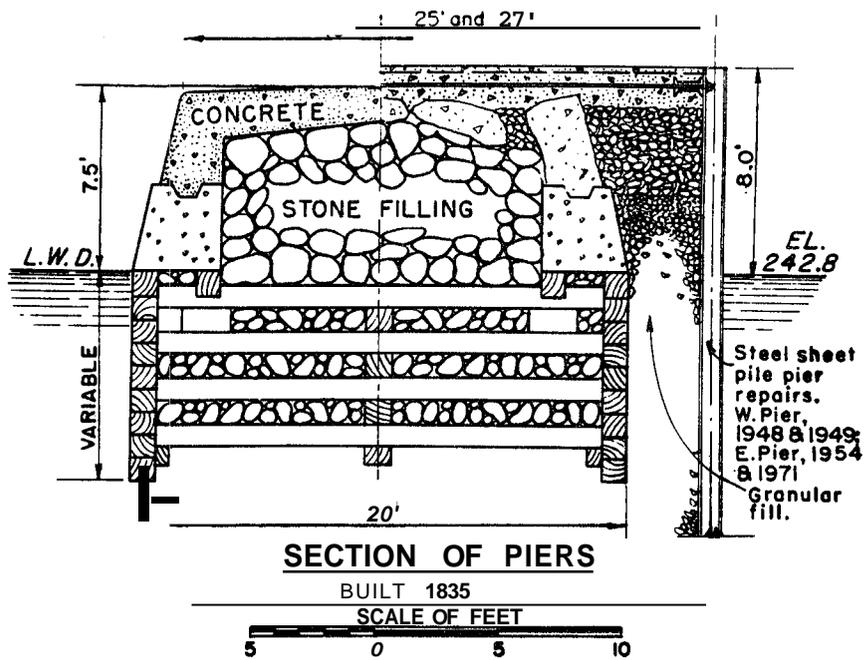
Typical pier cross sections, Rochester Harbor, New York
